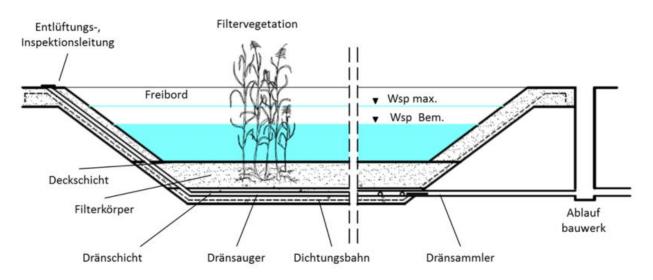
Schematic cross-section through a retention floor filter basin (DWA-A 178 Retentionsbodenfilteranlagen)
